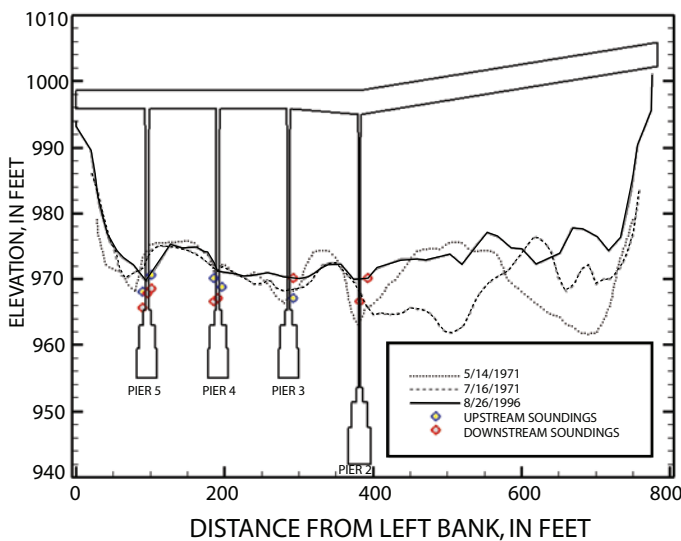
Upstream cross sections and pier soundings at bridge 524, Tanana River at Big Delta, Alaska. Pier soundings were made on August 26, 1996.
